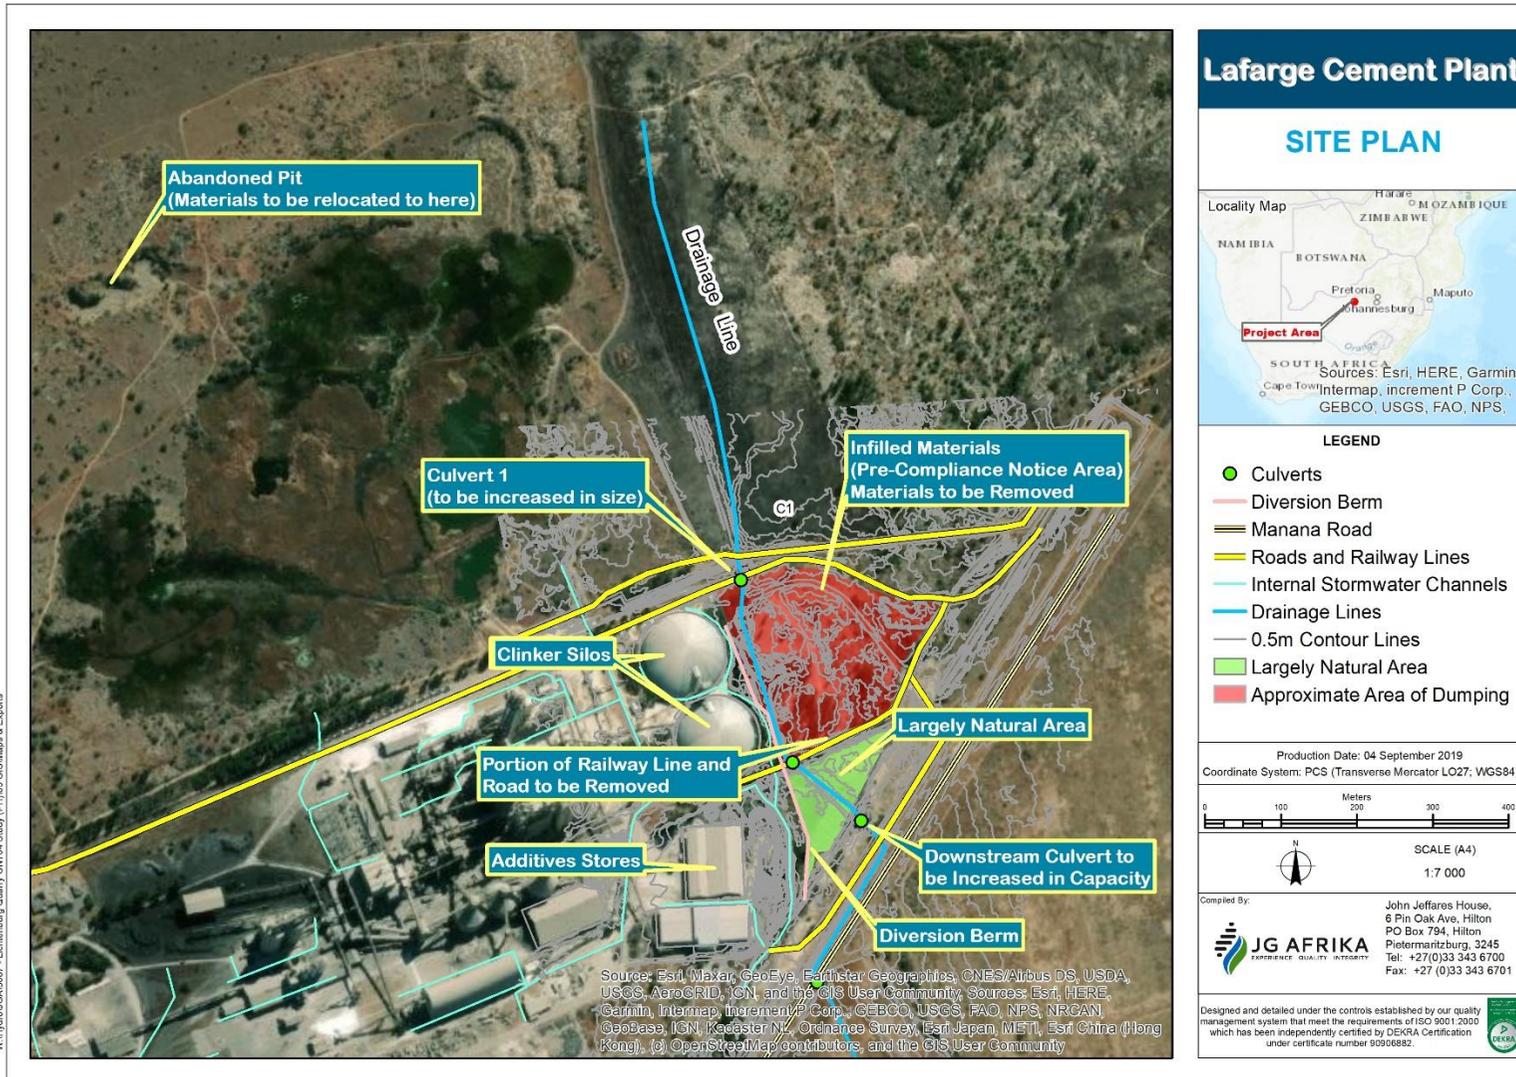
Lafarge Lichtenburg site plan for rehabilitation
